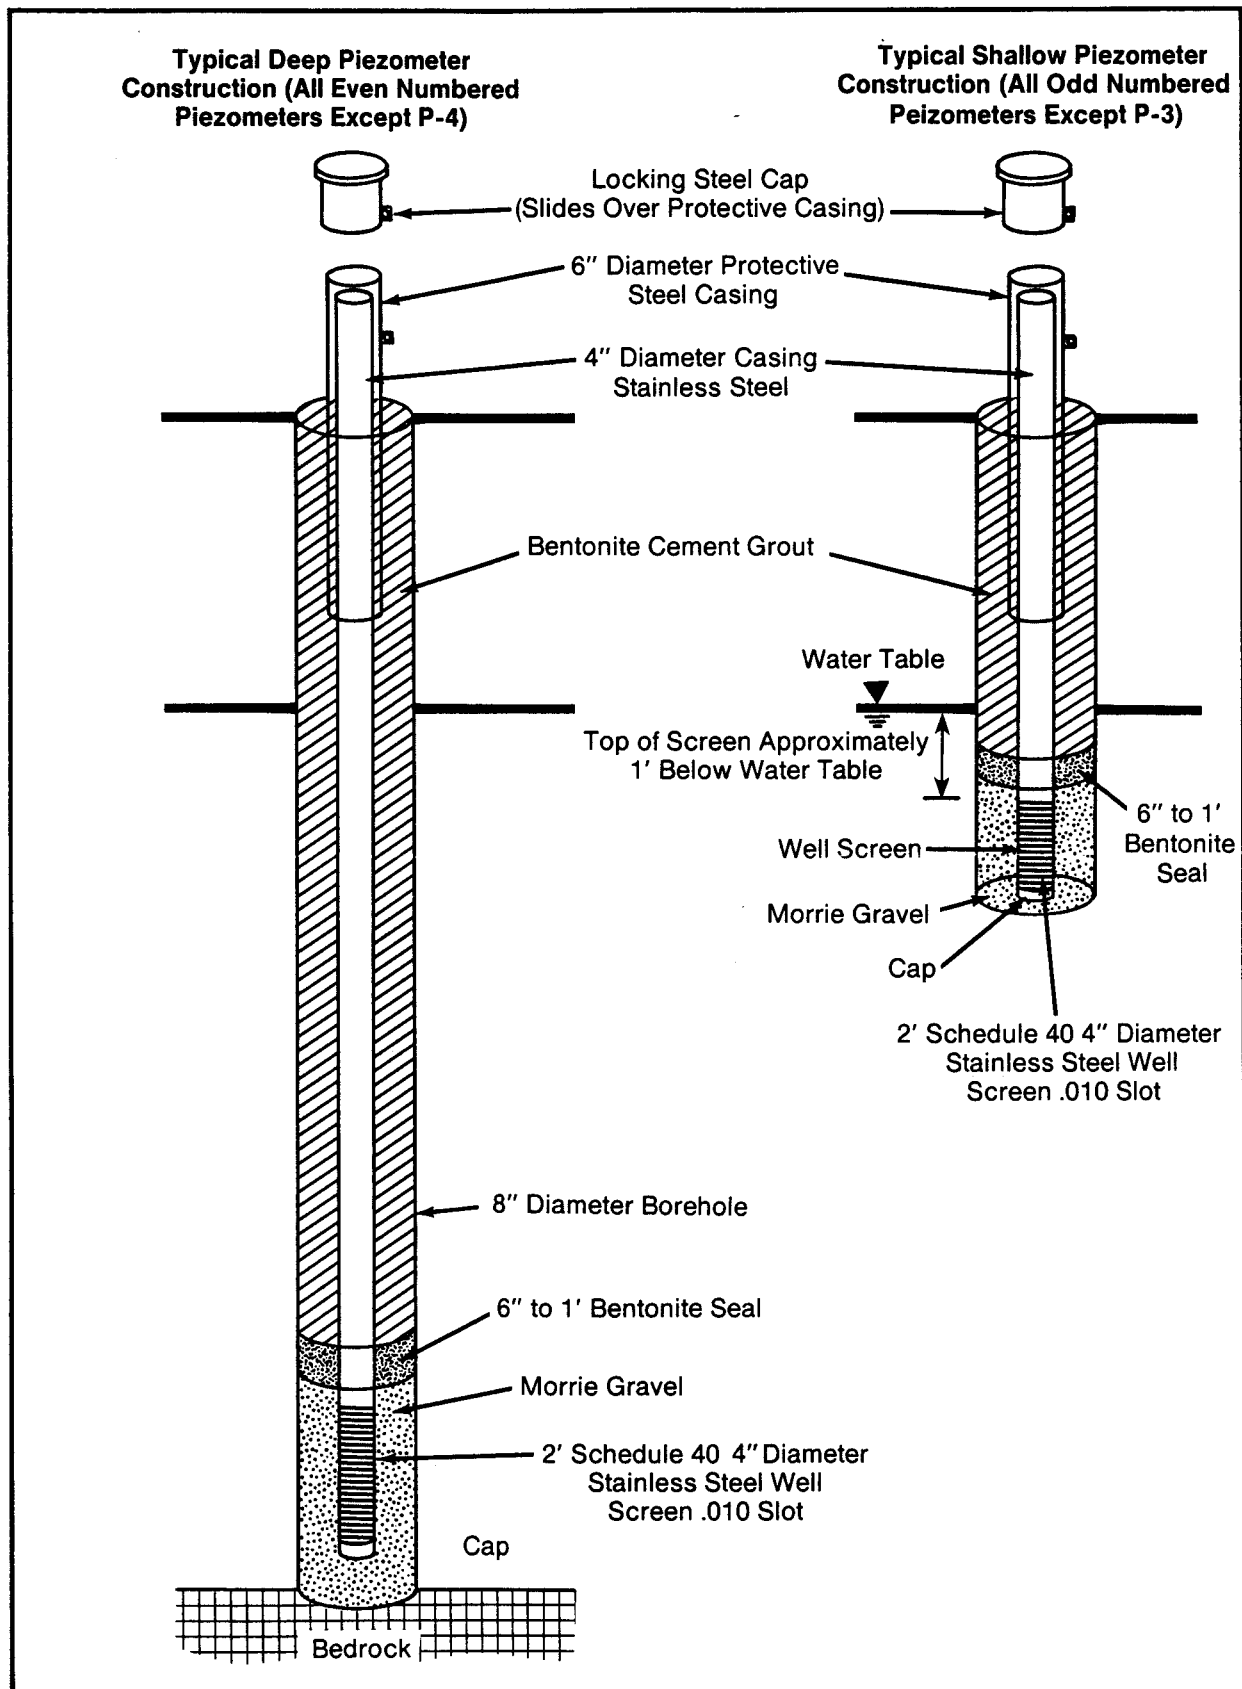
PIEZOMETER CONSTRUCTION DETAILS (TYPICAL)
